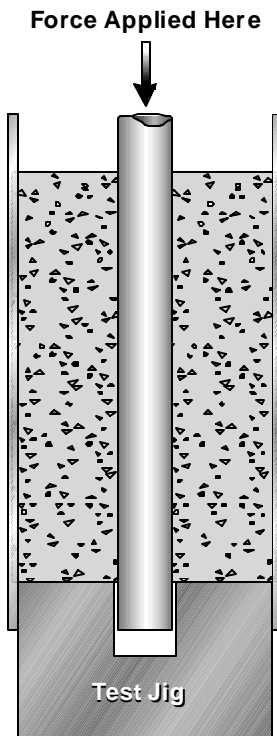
Cross-section of pipe-in-soft test fixture configuration for shear bond test.
